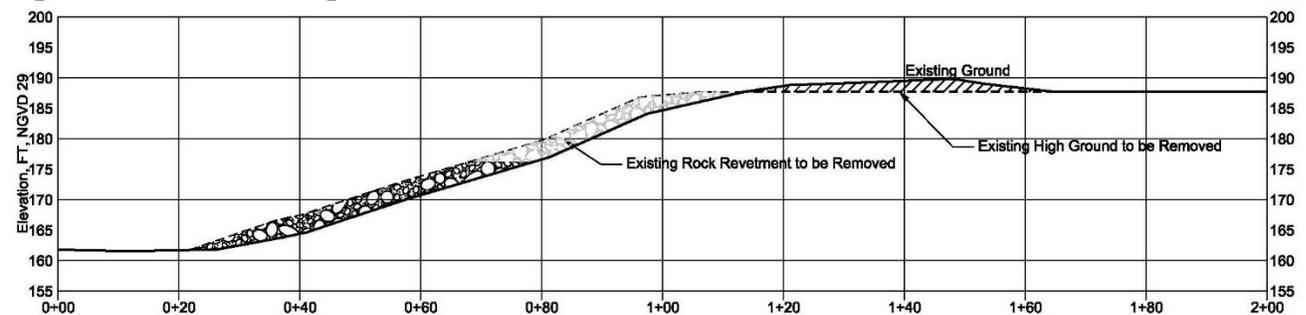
Half Bank Height Rock Revetment Removal Cross Section
